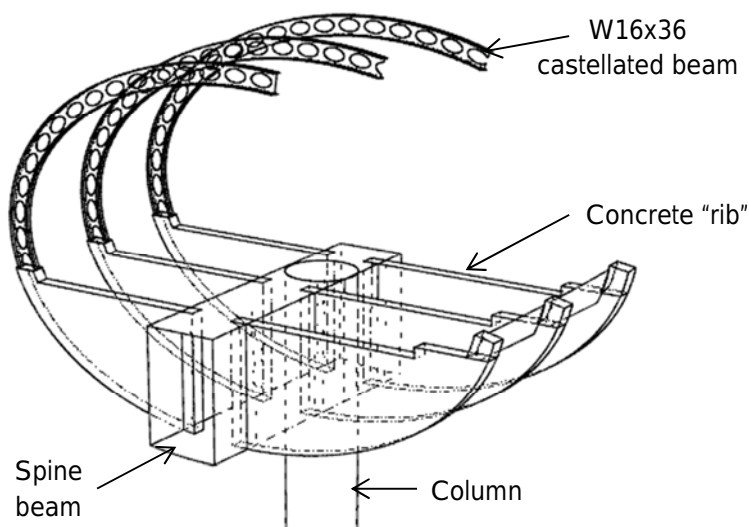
Typical section of the Optimized Design with concrete rib elements and castellated steel beams.
